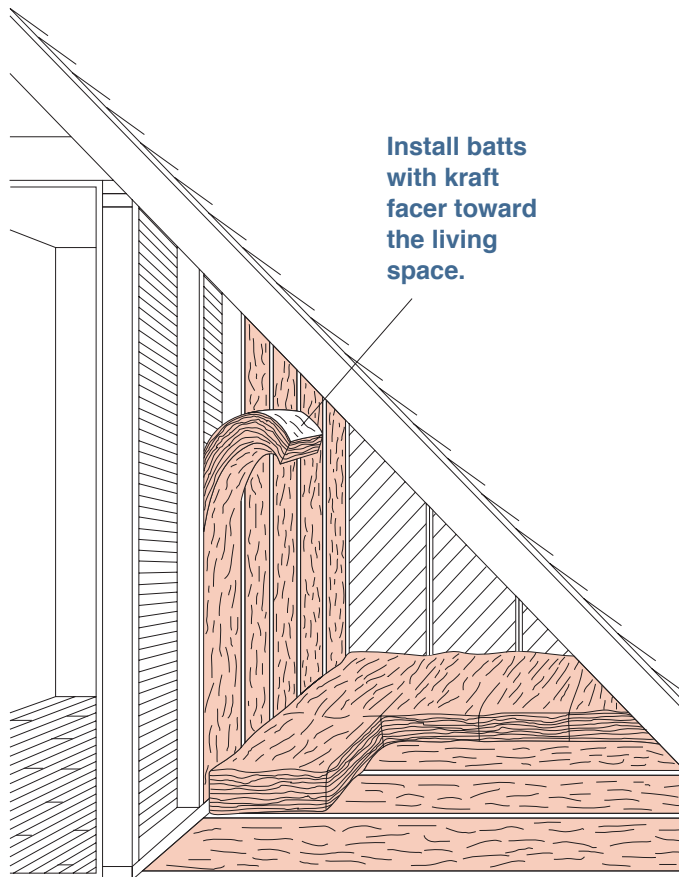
In Cape Cod style homes, where a knee wall separates the second story from an unheated attic space, install batts in the stud cavities.
